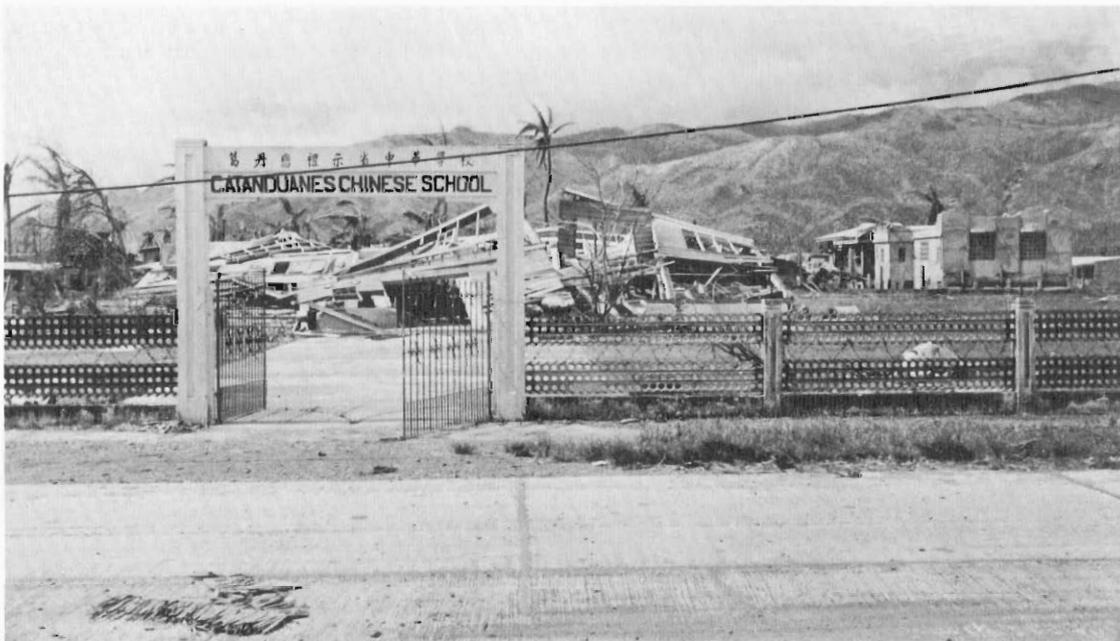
The Catanduanes school levelled to ground by Typhoon Sening (Joan). Poor vertical bracing was possibly responsible for the failure of this building.
